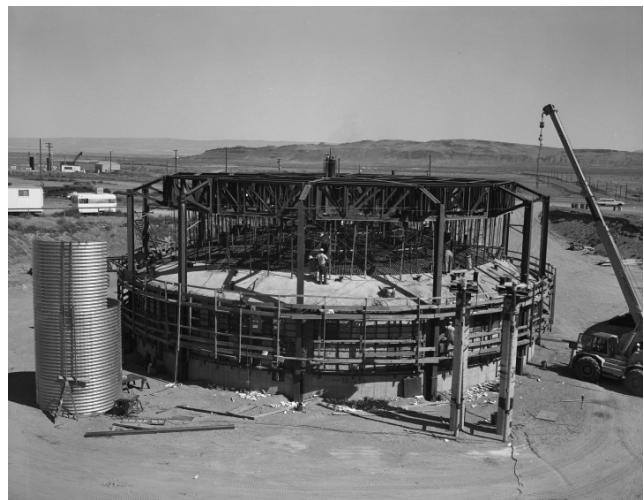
Tank AZ-102 Haunch and Dome Concrete Pour Progress, Showing Forms and Truss System (58580-2 Photo) (Taken 8/3/72)
